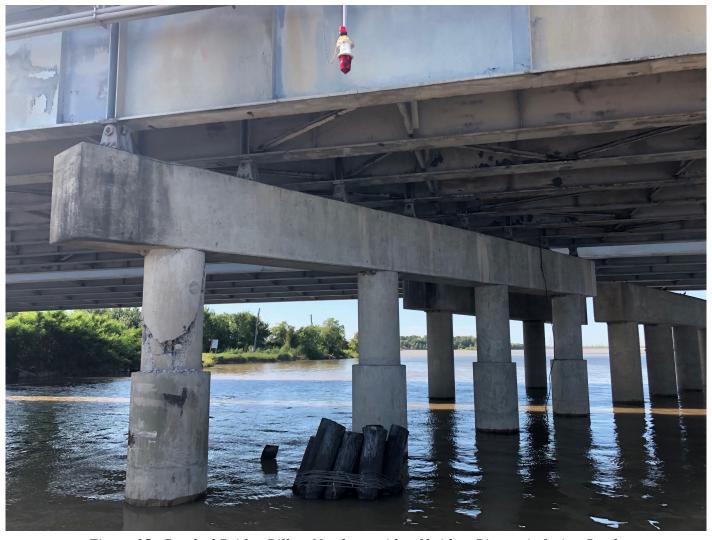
Cracked Bridge Pillar, Northeast side of bridge. Picture is facing South.
